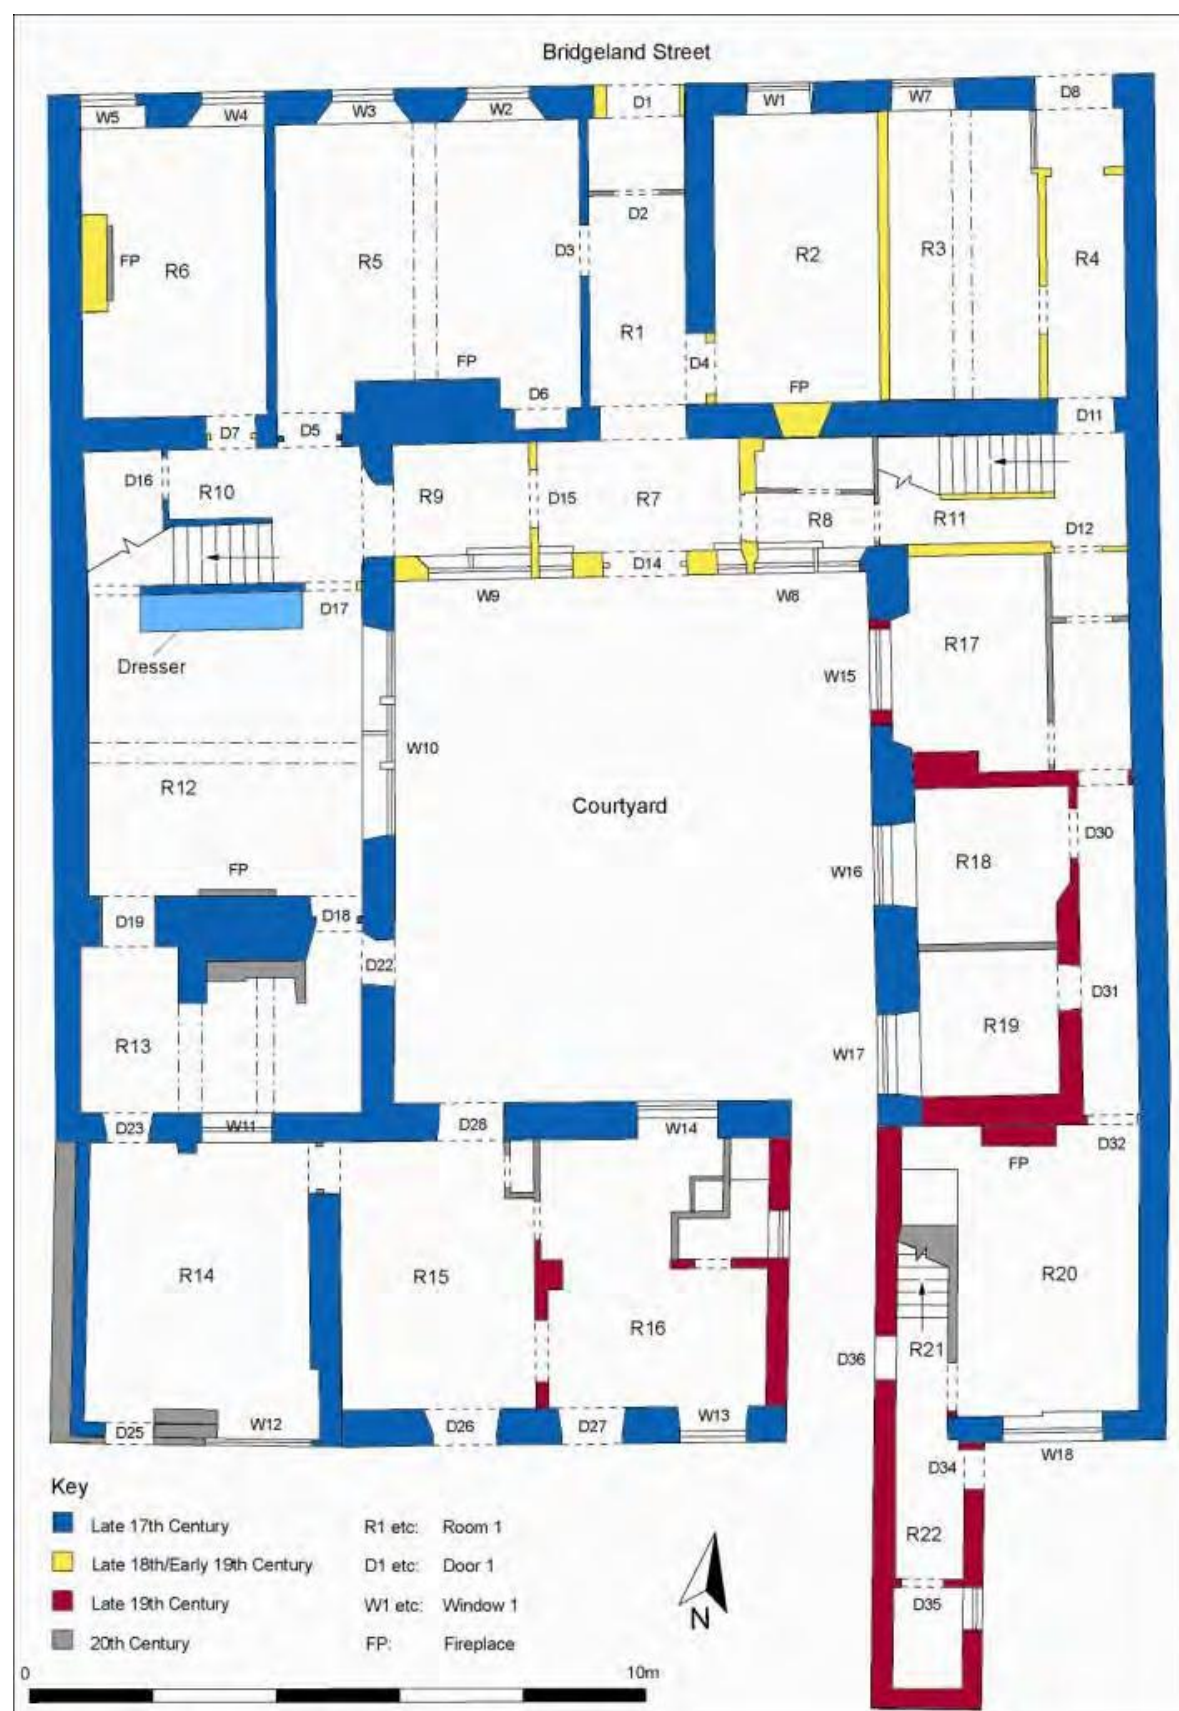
Phased ground floor plan of 28 Bridgeland Street.
